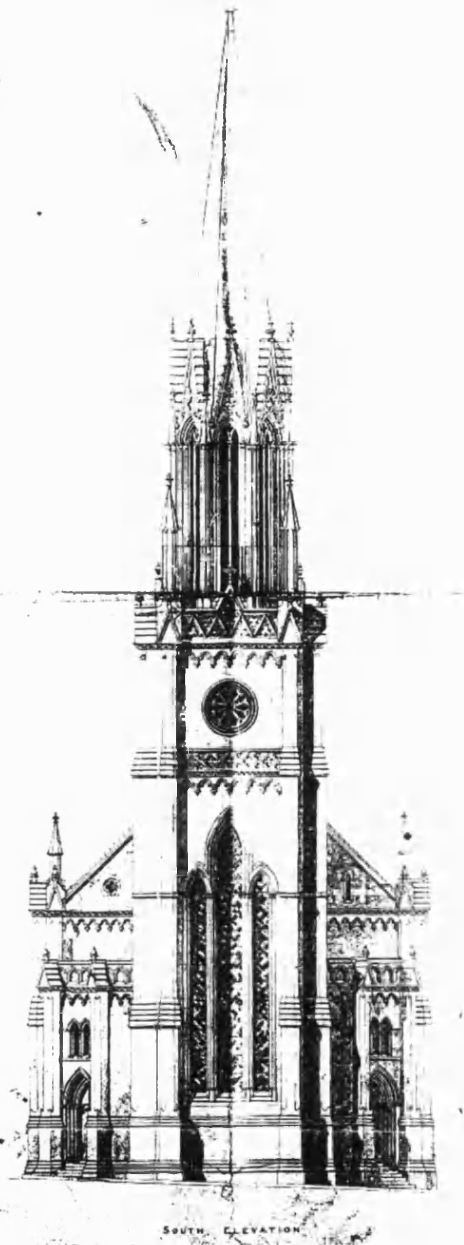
'St Michael's New Church, 1834, South Elevation, G. P. Manners, Contract Drawing • Biggs 5204.
